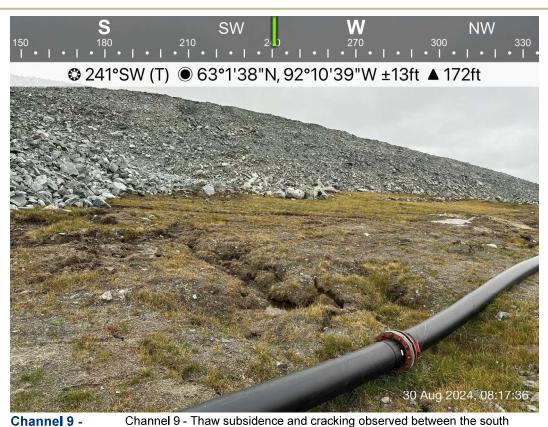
Shoulder of Channel 9 and WRSF3. Facing southwest.
